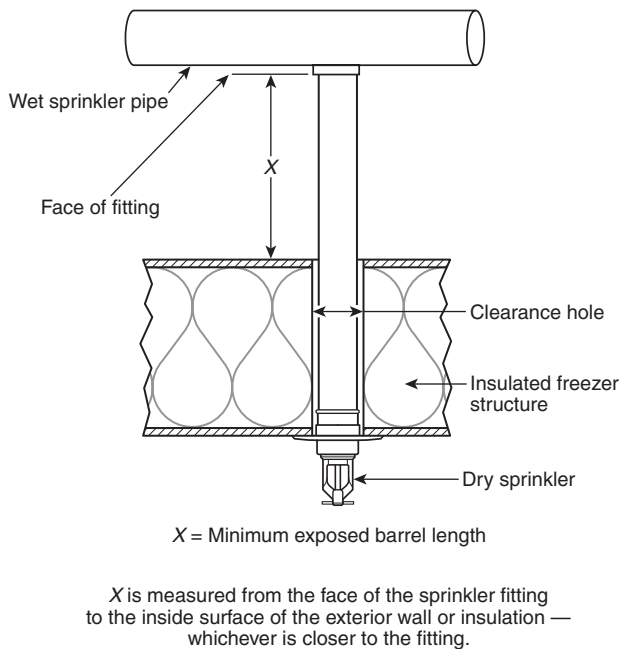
(b) Dry Pendent Sprinkler Through Ceiling or Top of Freezer.
